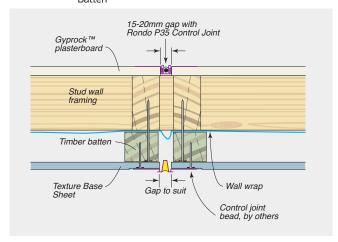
Control Joint at Junction with Masonry Wall – Structural Timber Batten
